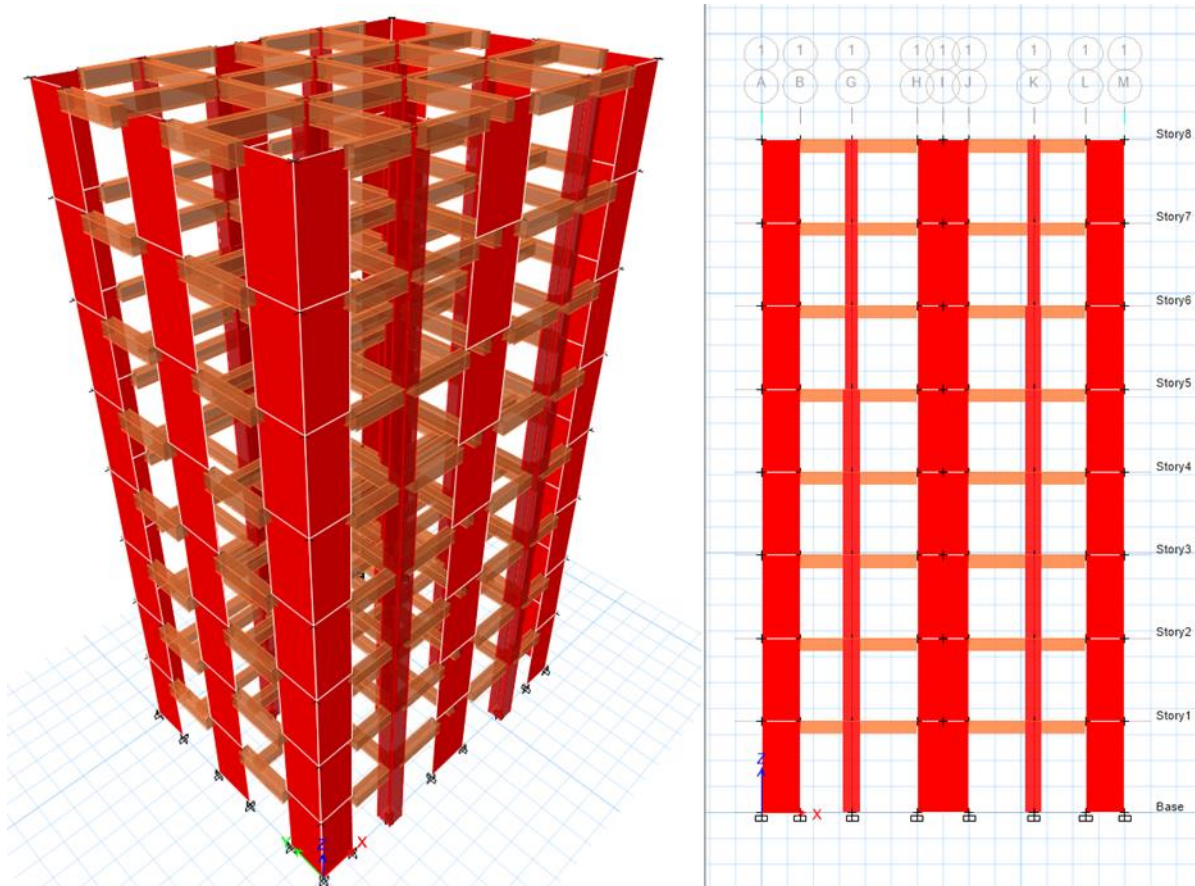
A sample building model consisting of a dual system (frame + shear wall) used in this study
